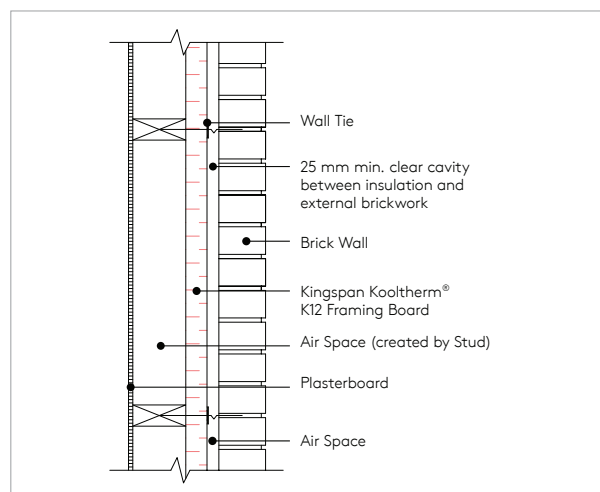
Side elevation – Brick Veneer wall with Kingspan Kooltherm® K12 Framing Board.
